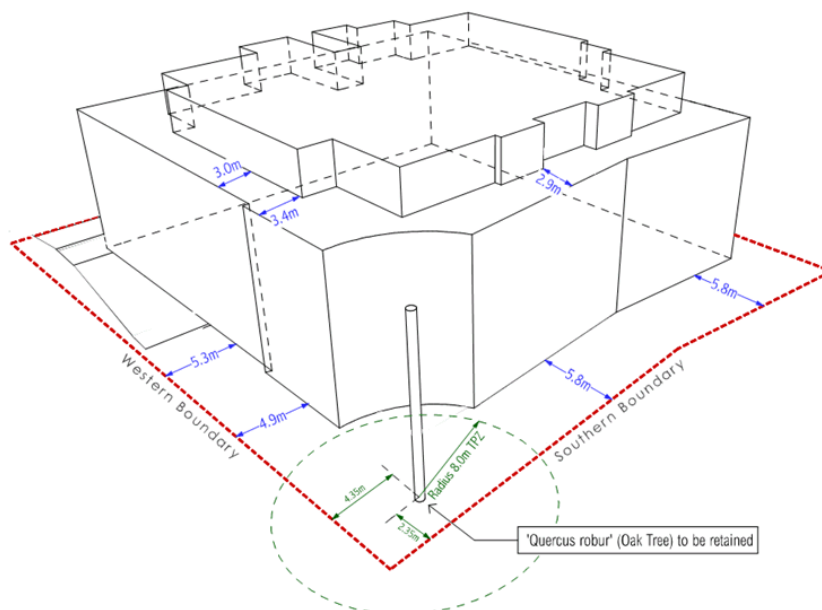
Indicative building envelope with minimum building setbacks indicated (south-west view)
